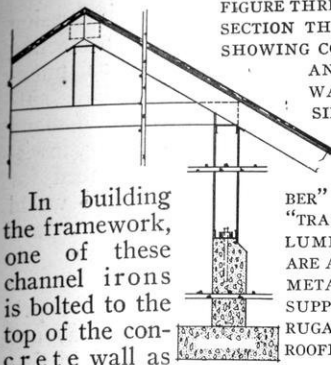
FIGURE THREE: VERTICAL CROSS-SECTION THROUGH GARAGE, SHOWING CONCRETE FOOTING AND FOUNDATION WALL UP TO WINDOW SILL: ABOVE THIS ARE SEEN THE CHANNEL IRONS OF "METAL LUMBER" TO WHICH THE "TRANSITE ASBESTOS LUMBER" WALL PANELS ARE ATTACHED: SIMILAR METAL FRAMEWORK SUPPORTS THE CORRUGATED ASBESTOS ROOFING.
